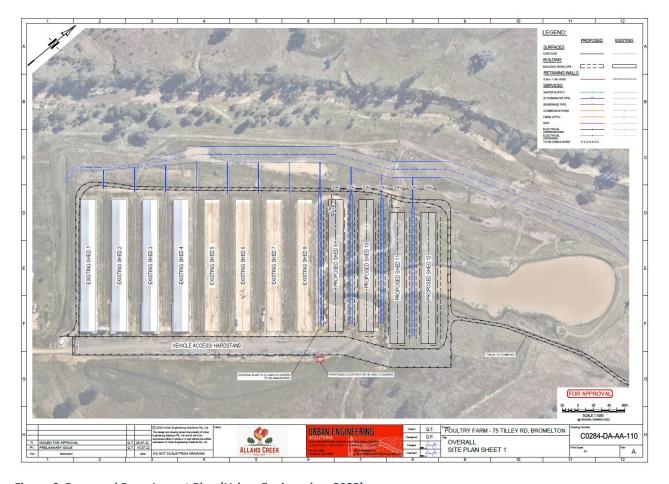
Proposed Farm Layout Plan (Urban Engineering, 2023)
